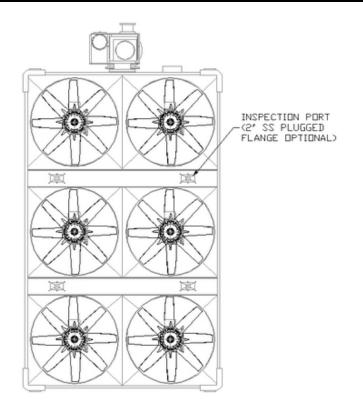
Mid-Basin Inspection Ports (6-fan tower module shown)
